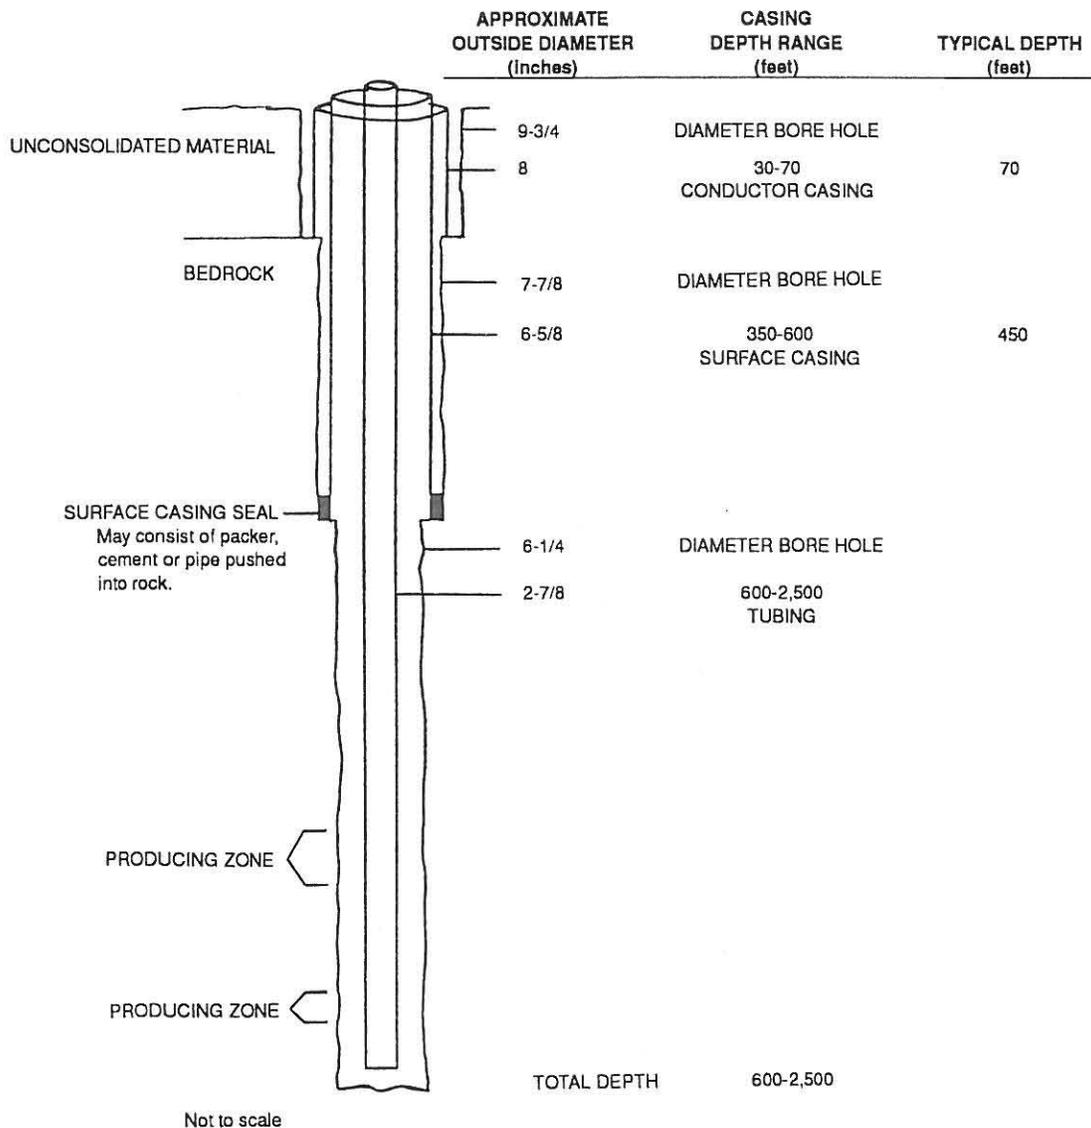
Typical construction of a shallow oil well in Warren, McKean, or Elk County. (Modified from Waite and Blauvelt, 1983).
